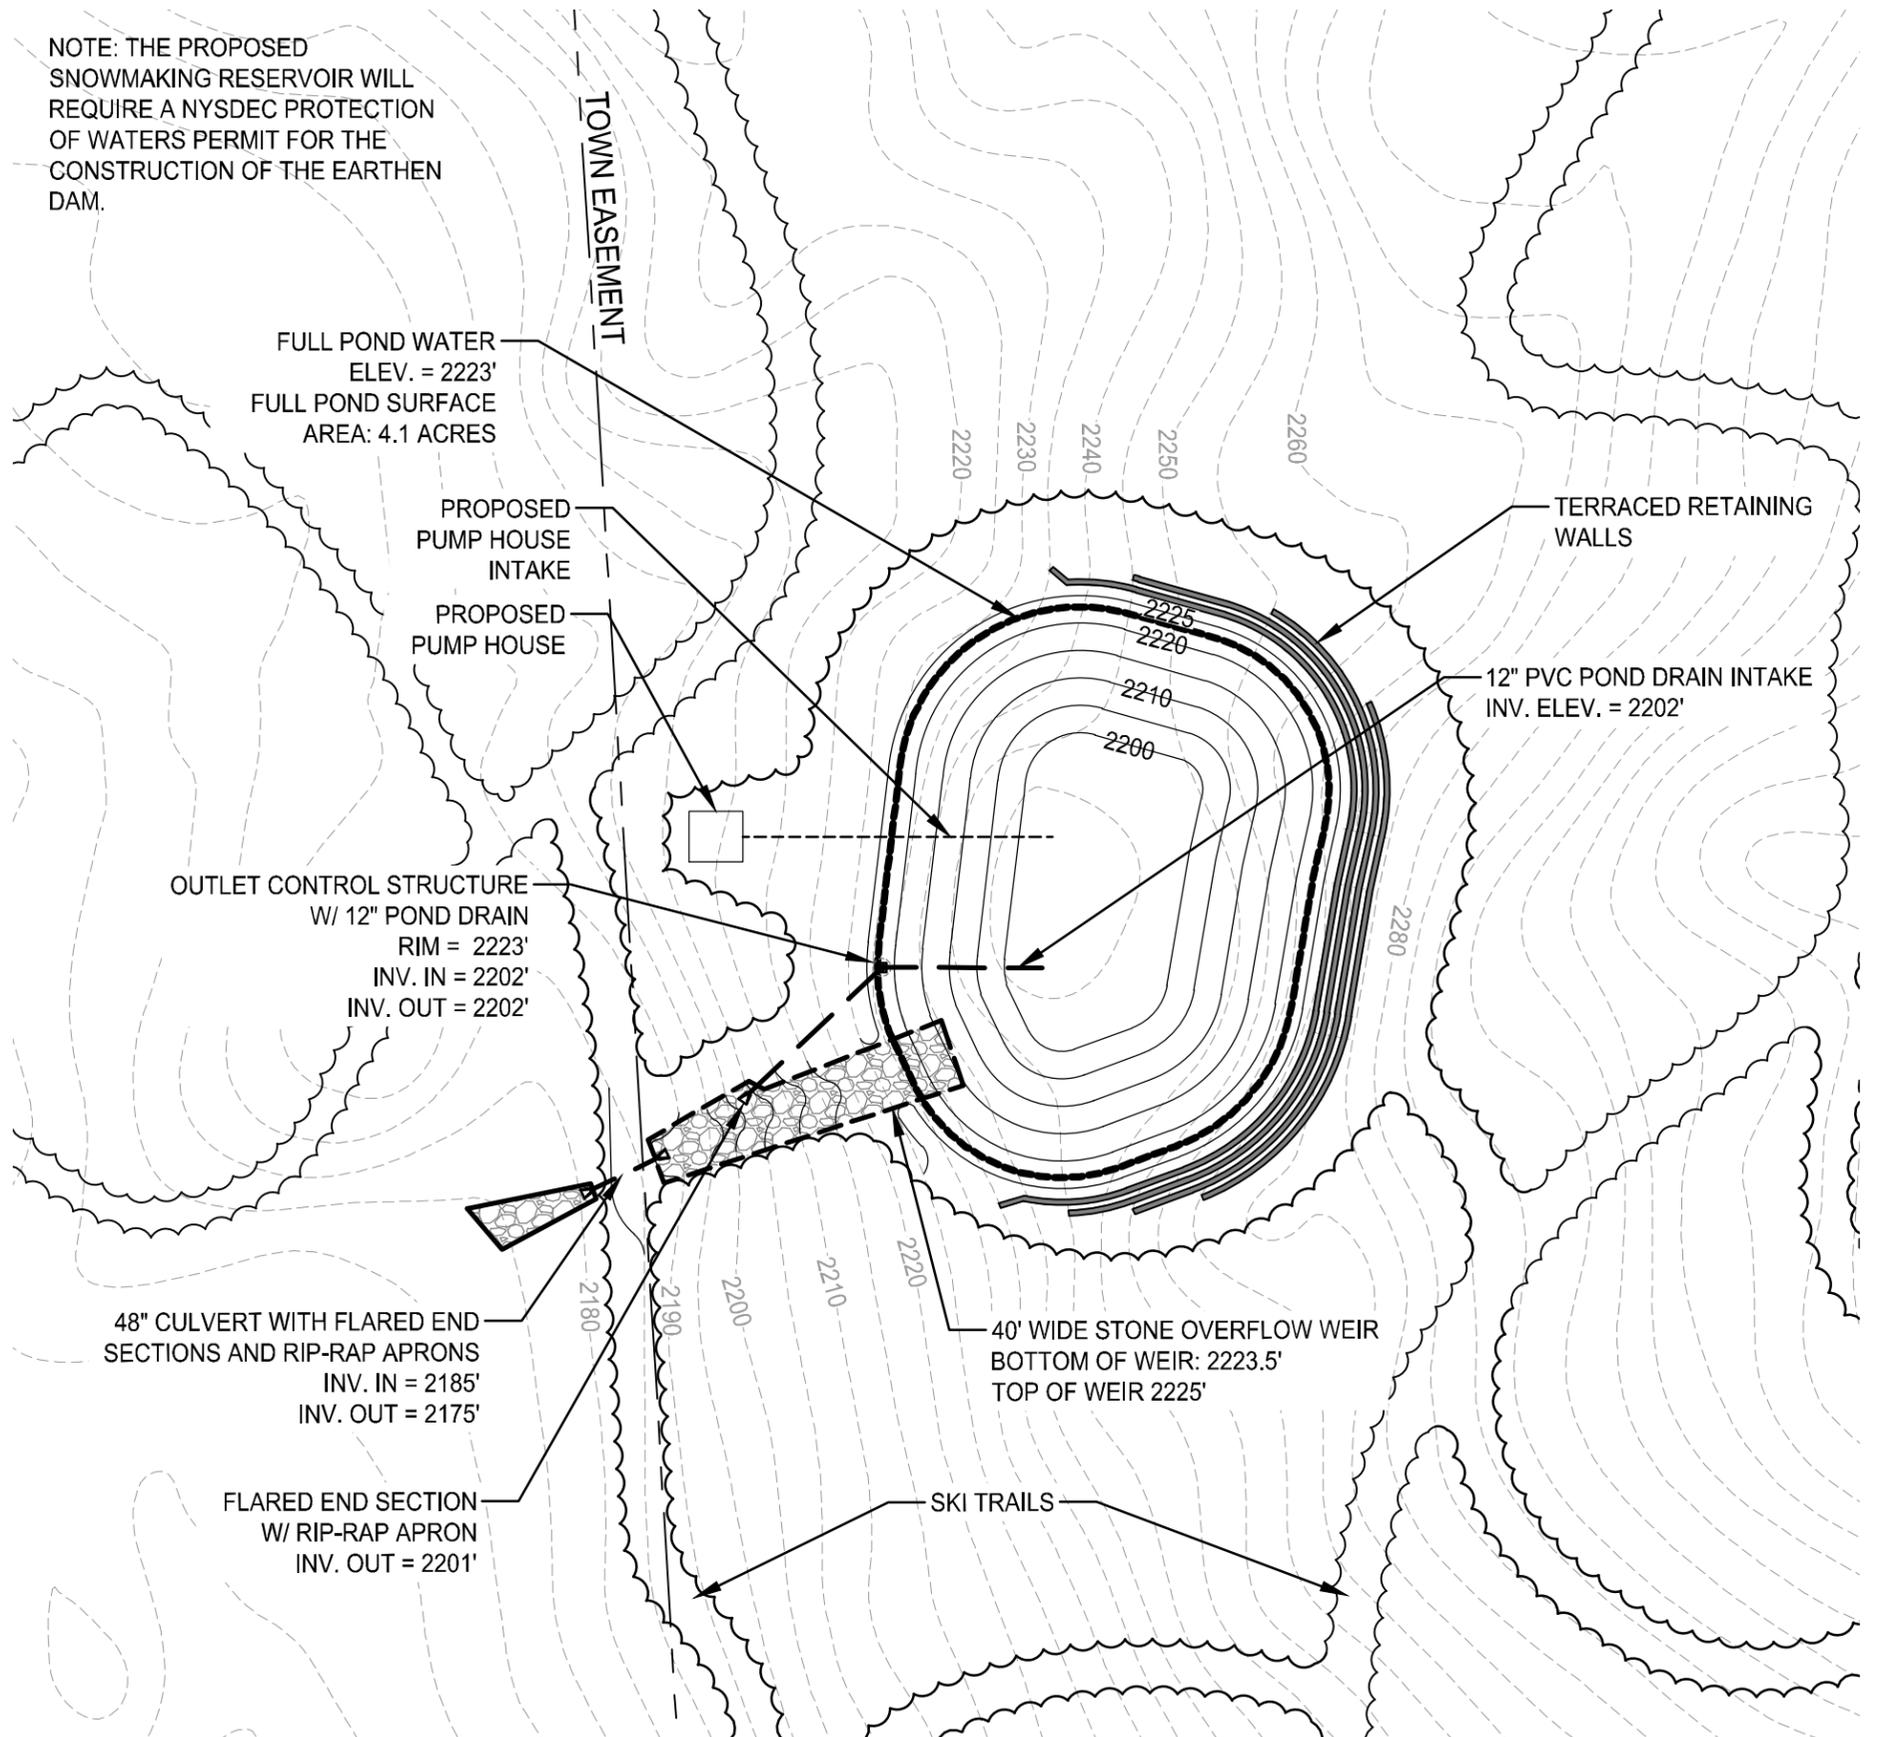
shows the location of the proposed pump house that will house the pumps that supply water to the snow guns on the new ski trails.
